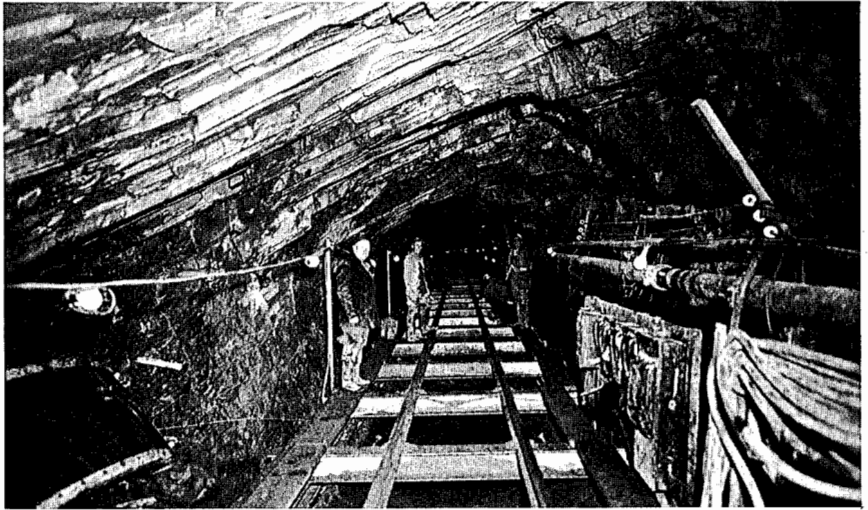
Branch tunnel between shafts 7 and 7B, looking east. Slabby argillite striking parallel to tunnel and dipping about 30° N. 12/30/48.
